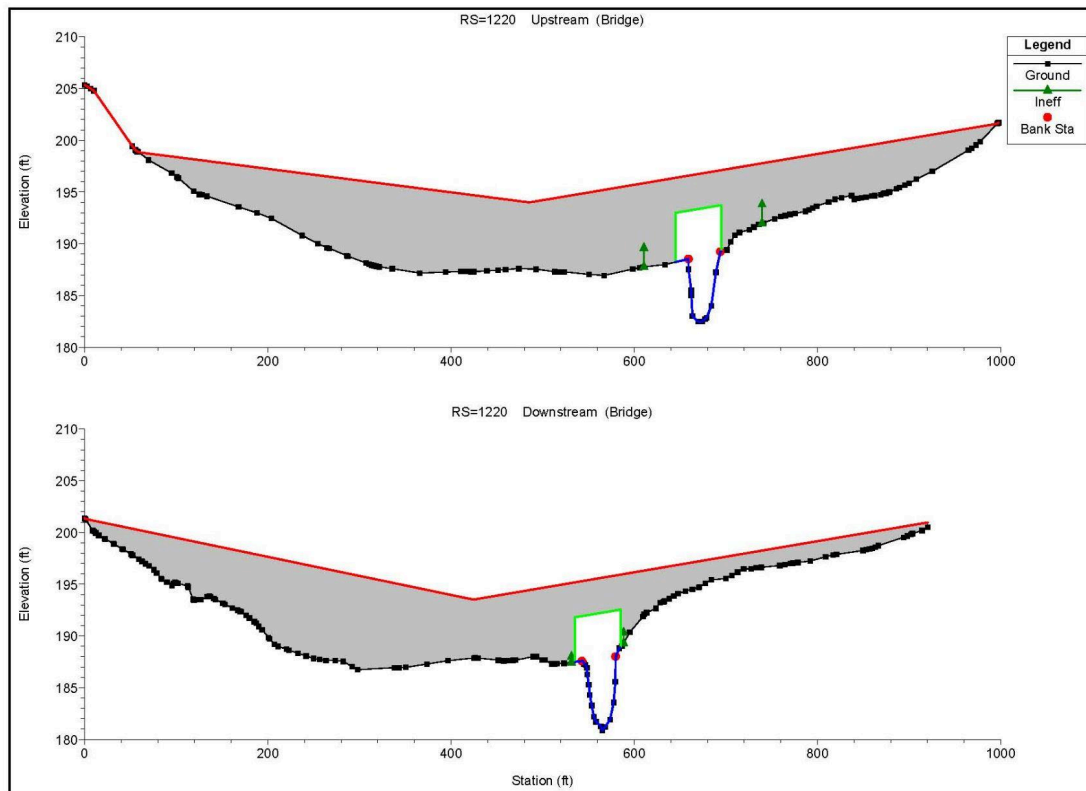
Upstream and Downstream Profile view of Proposed Bridge Structure at Otterdale Road, Otterdale Creek Crossing in HEC-RAS
